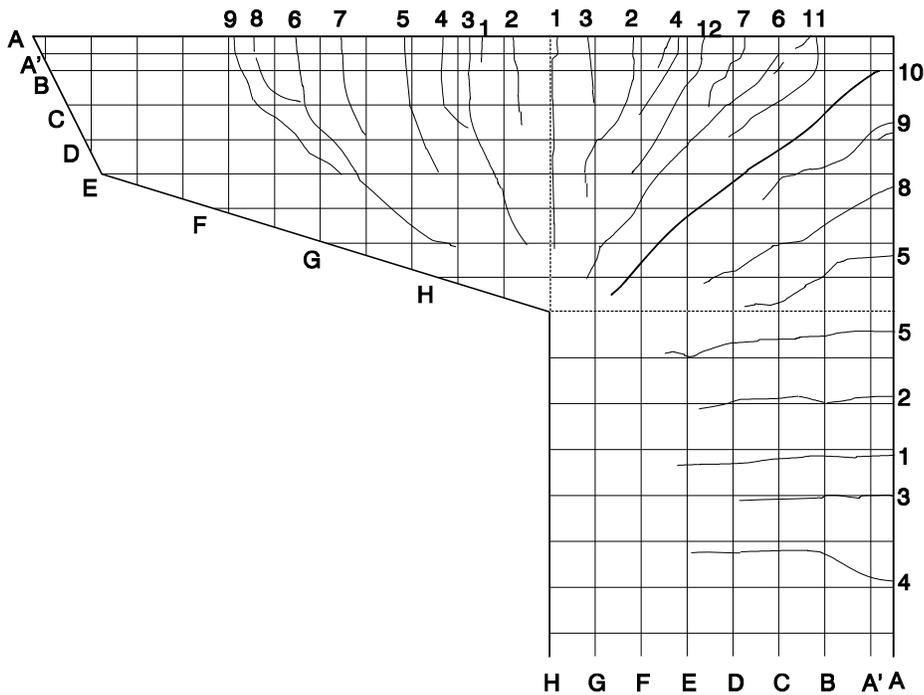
POJ-RC-100-TH cracking pattern on south face of specimen at failure
